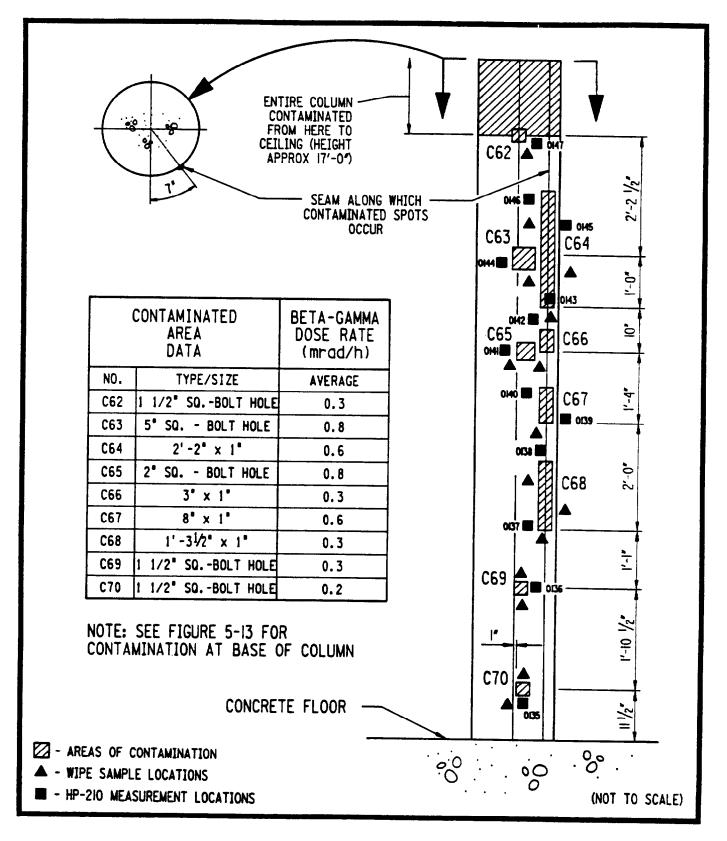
AREAS OF CONTAMINATION - COLUMN 3, SOUTH FACE (ROOM 1, FIRST FLOOR)
